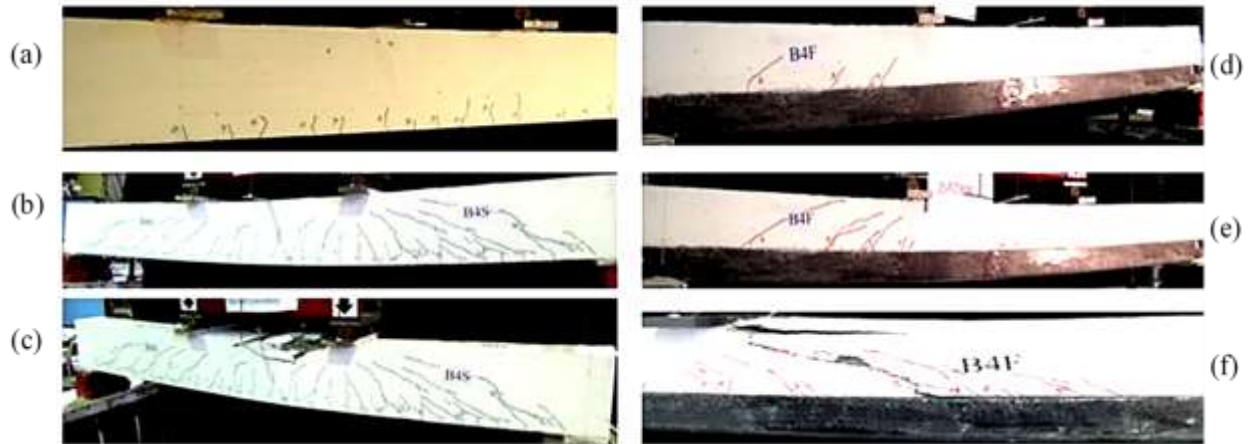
Cracking sequence and failure modes of Group IV beam specimens at different loading stages a) Beam B4S at initial cracking (b) Beam B4S at ultimate stage (c) Beam B4S after failure (d) Beam B4F at initial cracking stage (e) Beam B4F after failure
